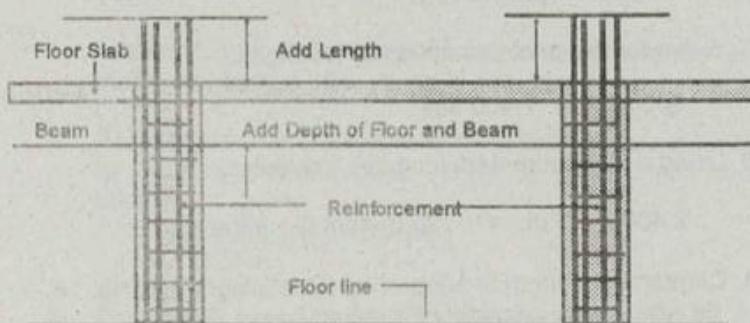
POST AND COLUMN REINFORCEMENT
